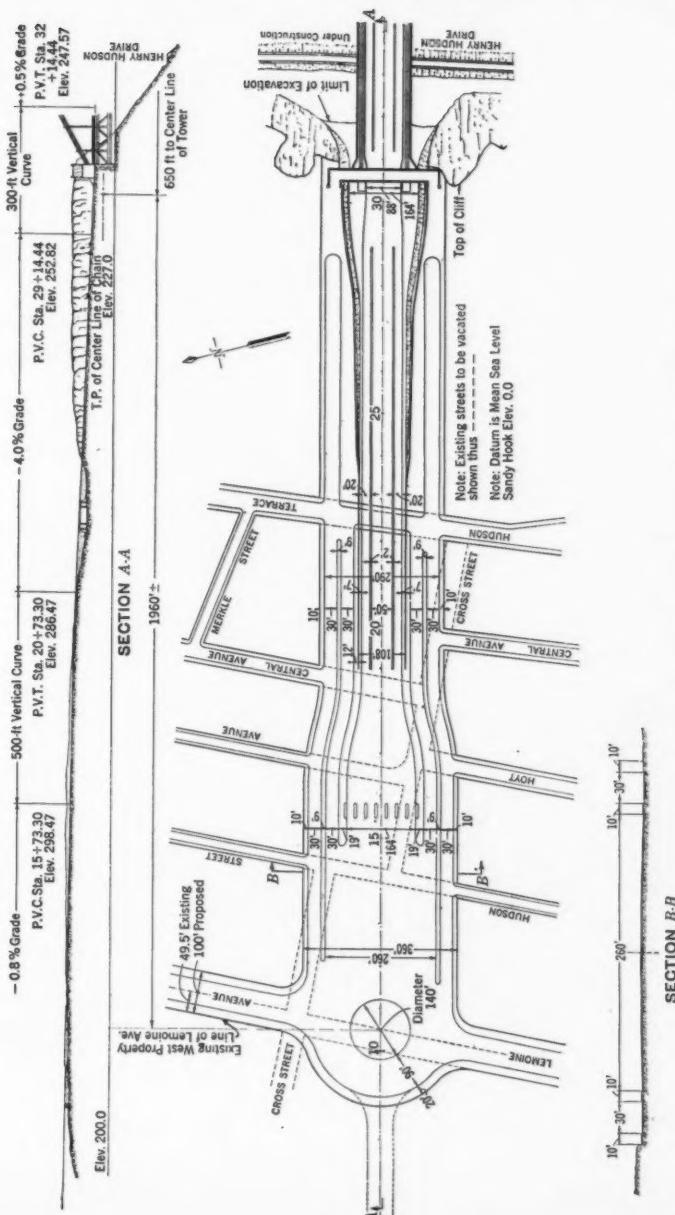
ORIGINAL PLAN OF NEW JERSEY APPROACH AS SUBMITTED.
